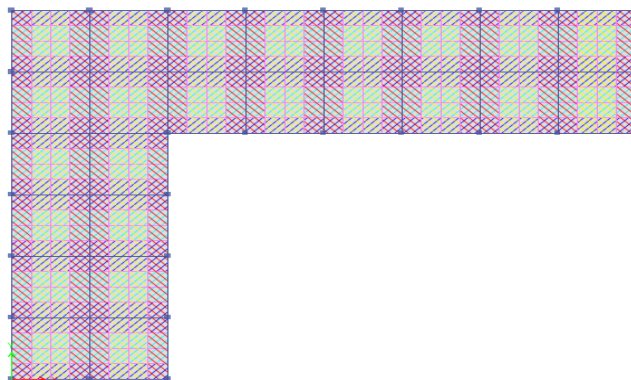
2D Plan View of 8 Story L-shape Building
